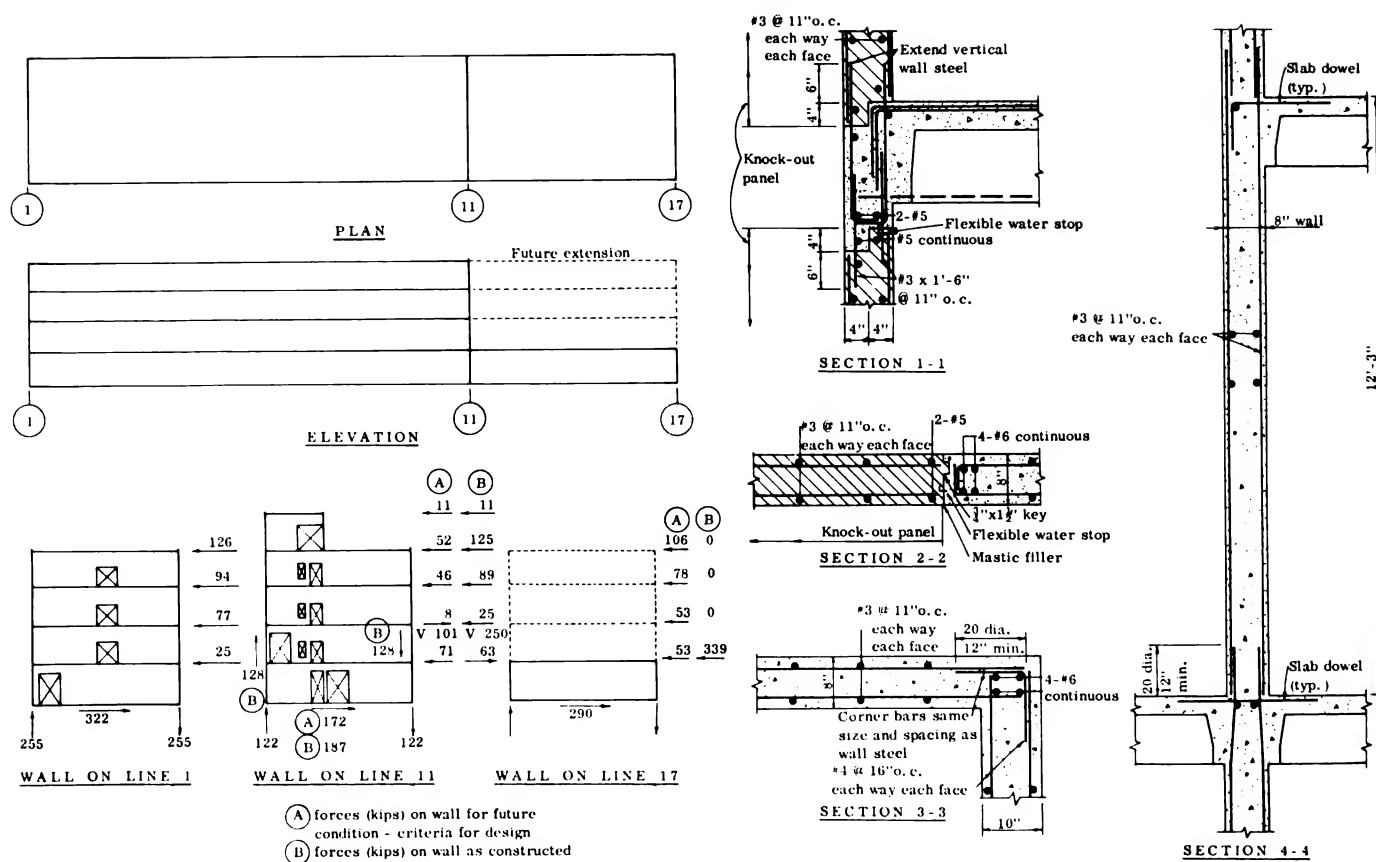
Pacoima Memorial Lutheran Hospital. Elevation of wall line 11.
